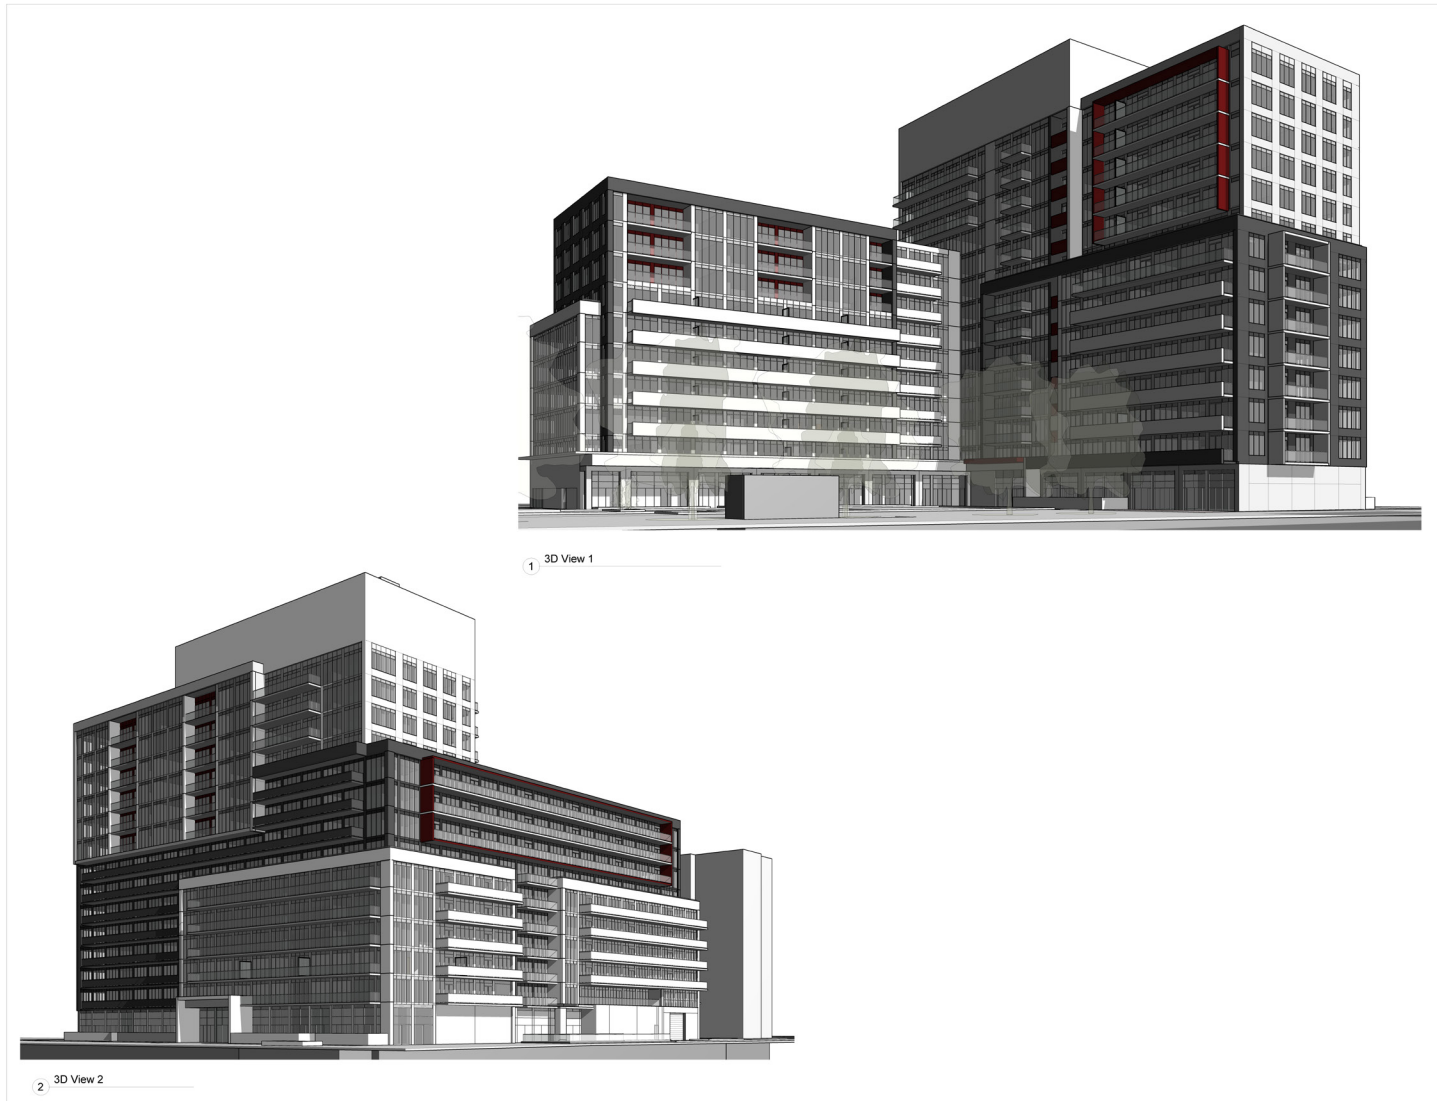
Rendering of the Proposed Building: Views Looking North (top image) and south (bottom) (Source: onespace)
